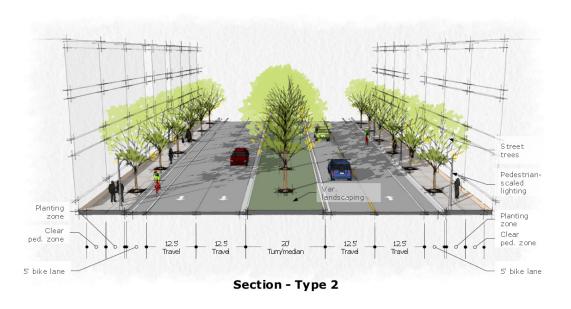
Configuration and dimensional requirements for street section Type 2 areas identified in the Street Section Plan.
